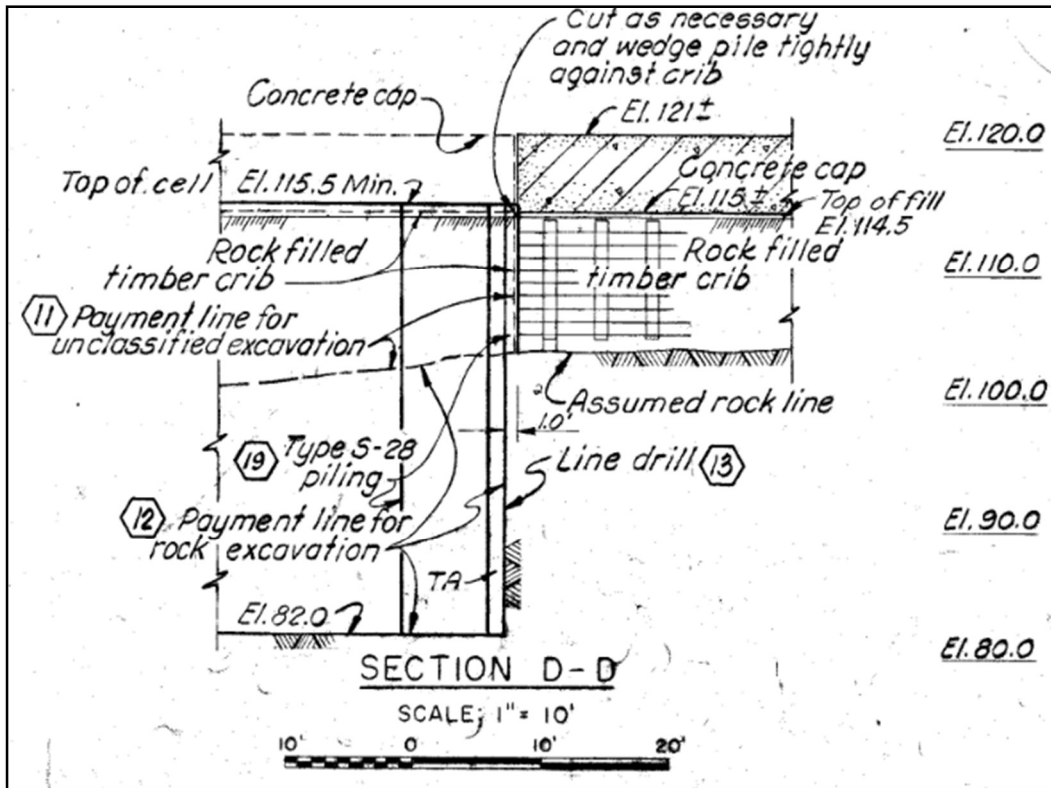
1964 WCP Extension Drawings – Detail A, Section D-D
